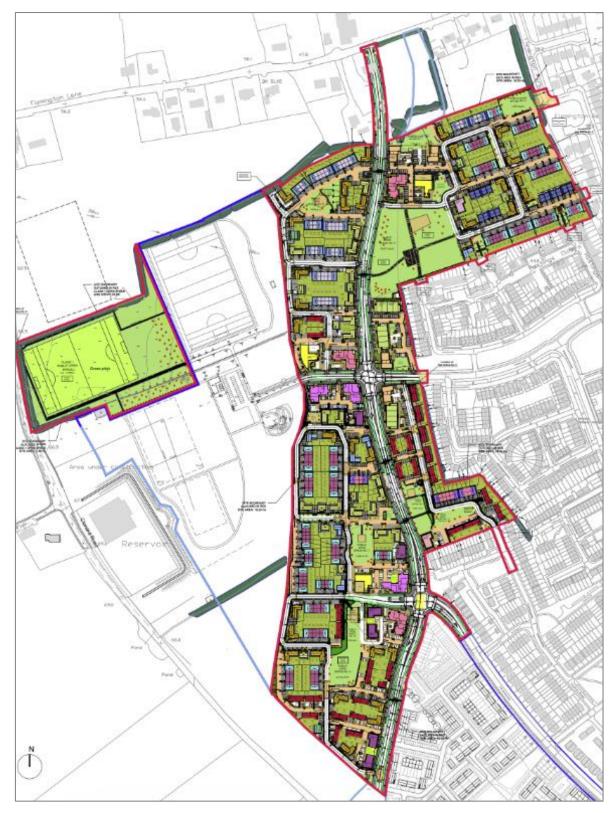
Extract from the Proposed Site Layout Plan as prepared by Ferreira Architects.
